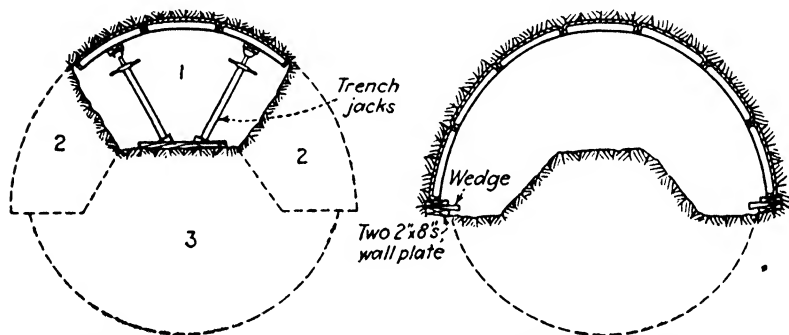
Sequence of excavation and setting of liner plates in a small tunnel.
